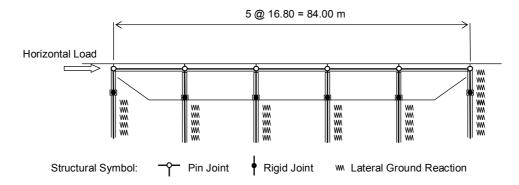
Frame Structural Model (in the case of Manohara Bridge)
